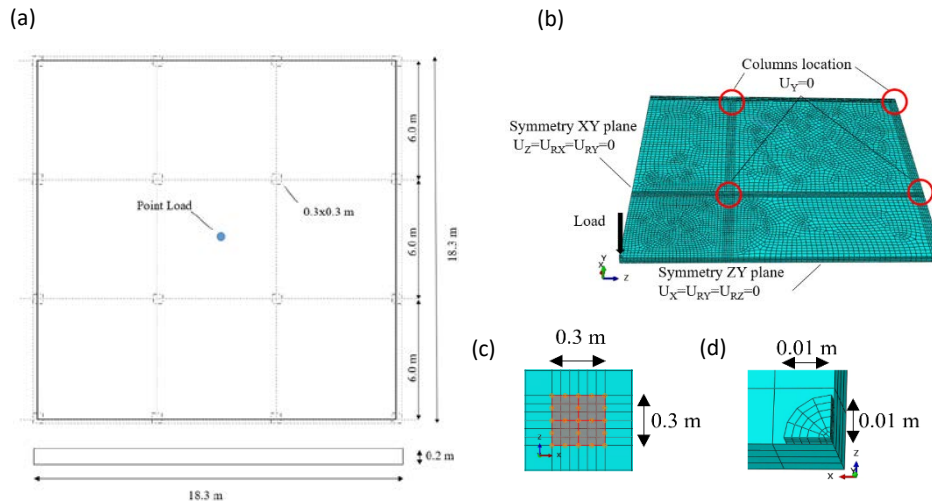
Elevated slab test (a) Test set up (b) FE model (c) Columns detail (d) Loading plate.
